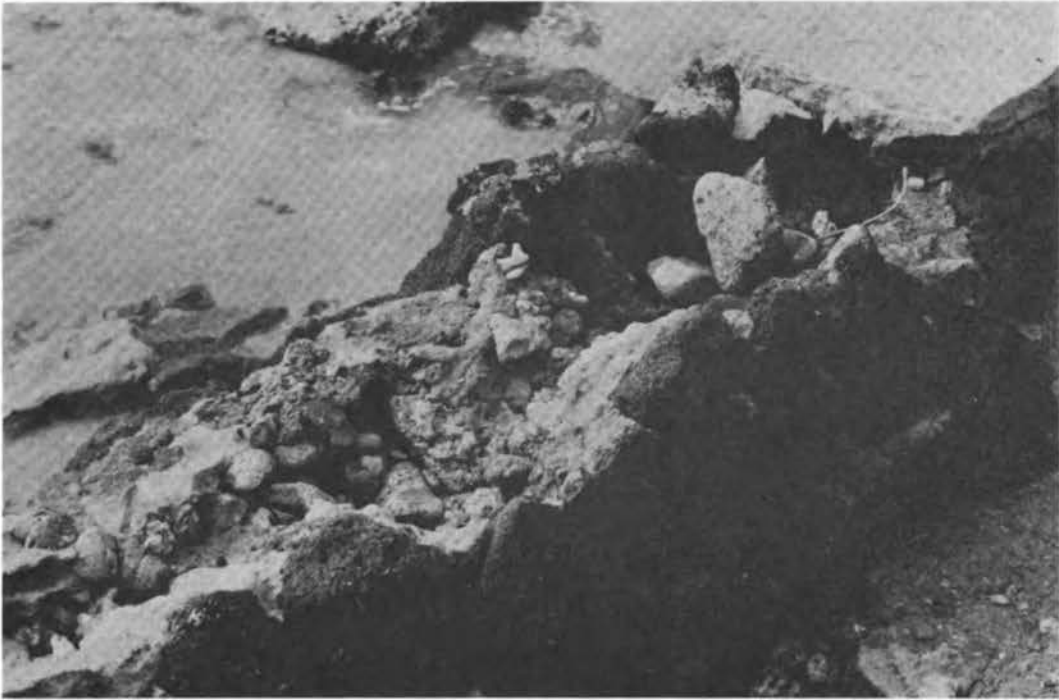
Damaged unreinforced grouted lava rock seawall.
